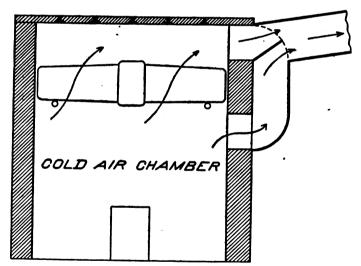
Heater and Mixing Damper with Brick Casing. Damper between Heater and Register.
